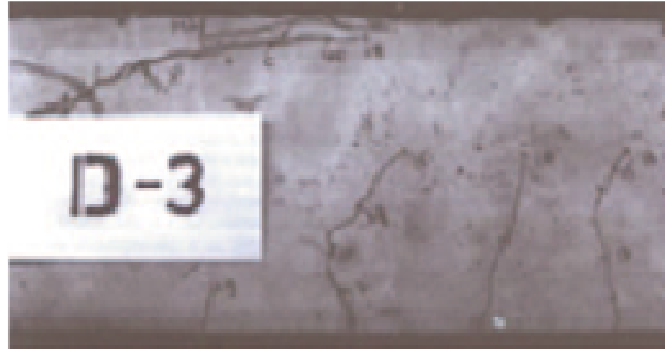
Horizontal splitting of the compressive zone occurring at a distance of around $2.5d$ from nearest support between tip of inclined crack and extreme compressive fibre
